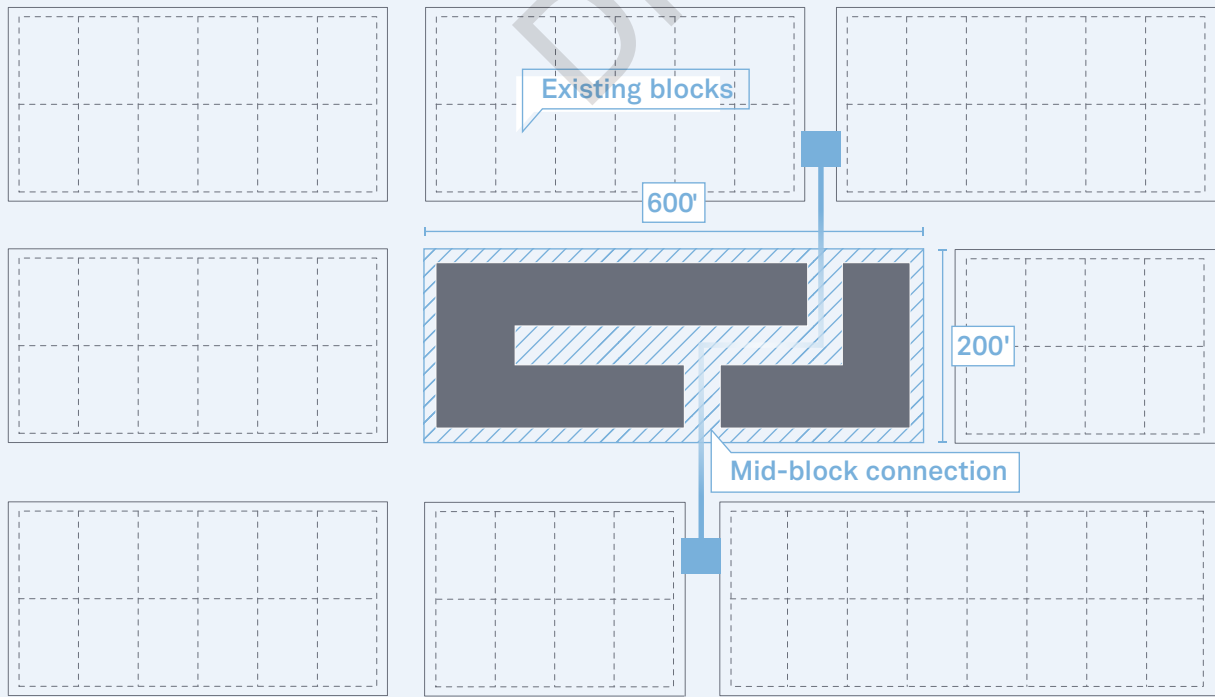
The proposed block responds to the existing neighborhood block pattern. The placement of buildings provides an internal alley that aligns with the surrounding street grid.
